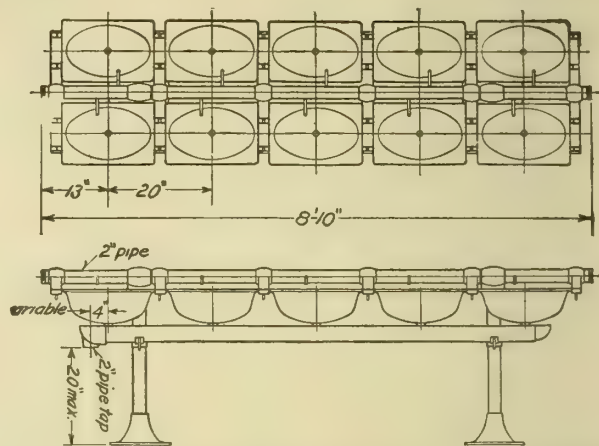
PLAN AND SIDE ELEVATION, GIVING DIMENSIONS
